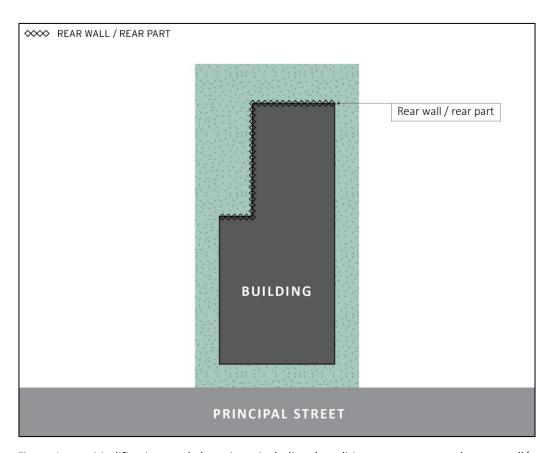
Modifications and alterations, including demolition, are exempt to the rear wall/rear part of building
